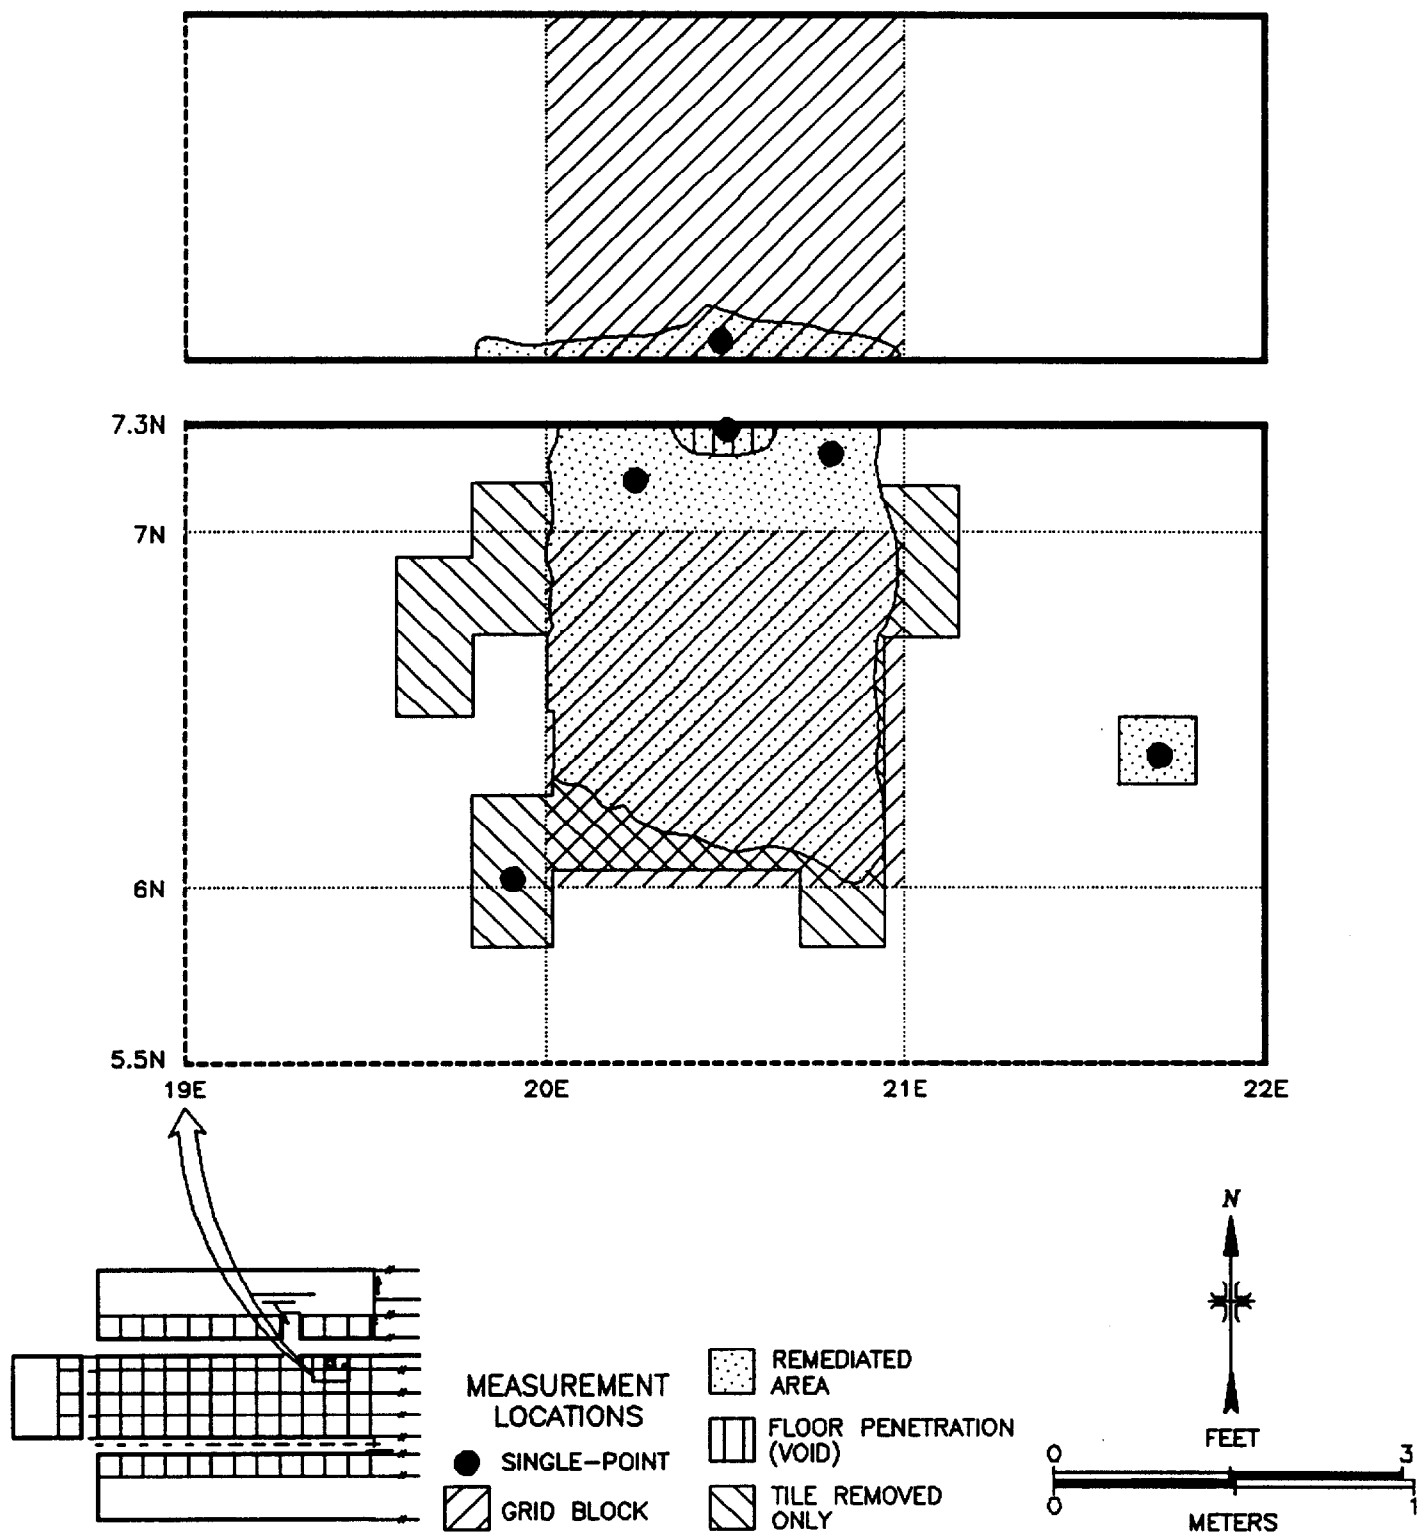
Building 28, First Floor Hallway Remediated Area Outside Lab 3 – Measurement and Sampling Locations
